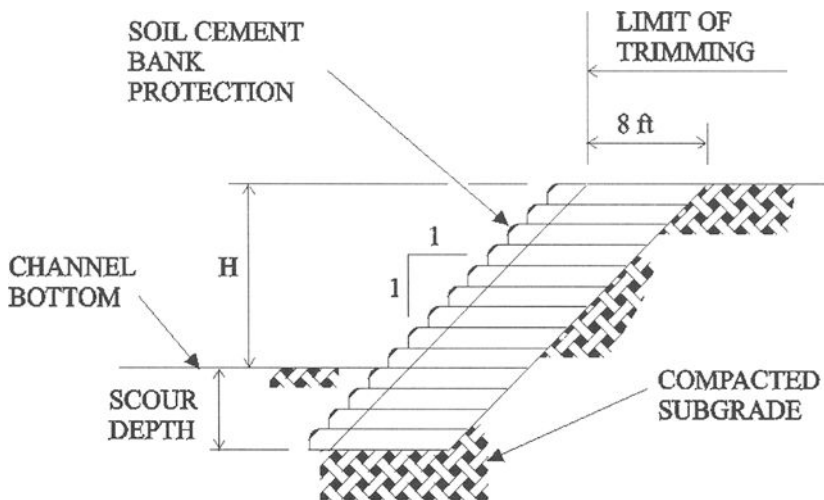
Typical Bank Protection Section at Tucson, Arizona.
